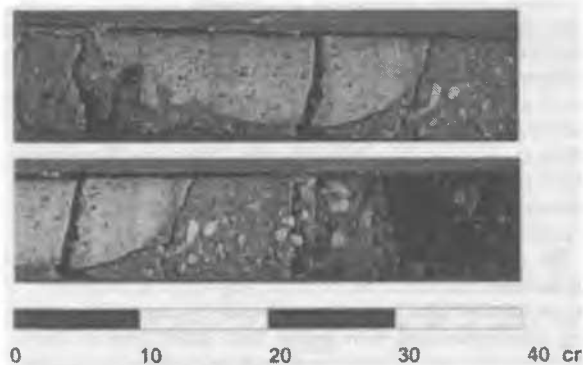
Drill cores from jet grouted structure executed in Berlin Sand
